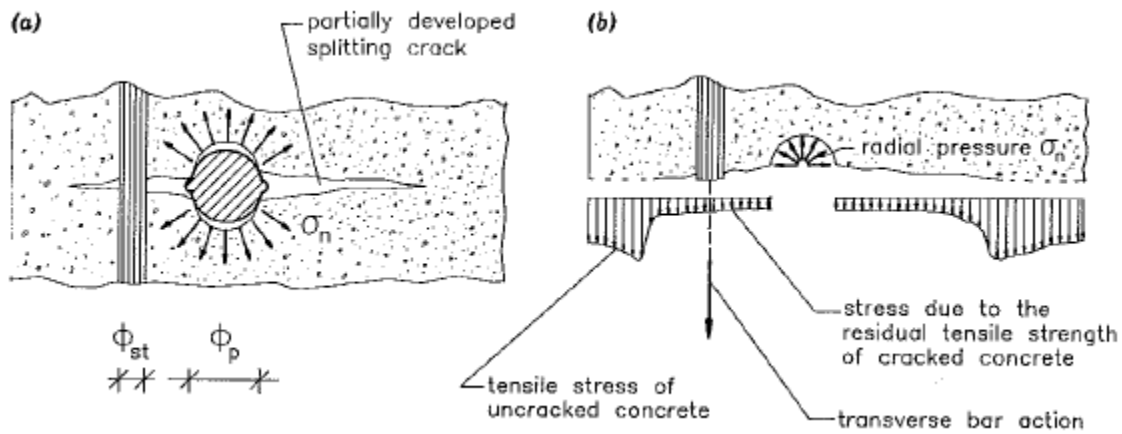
Splitting crack and confining actions around ribbed bar
